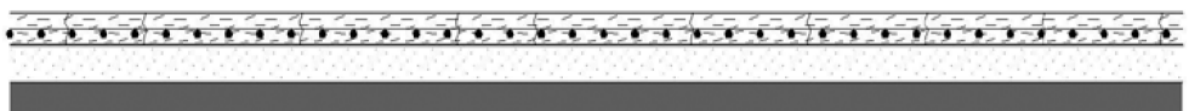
Ultra thin Continuously Reinforced Concrete Pavement
